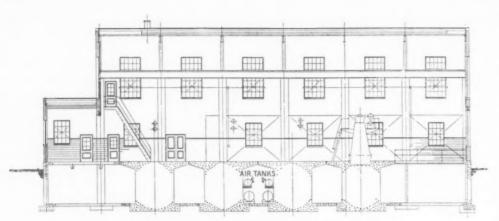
SECTION THROUGH POWER-PLANT BUILDING
